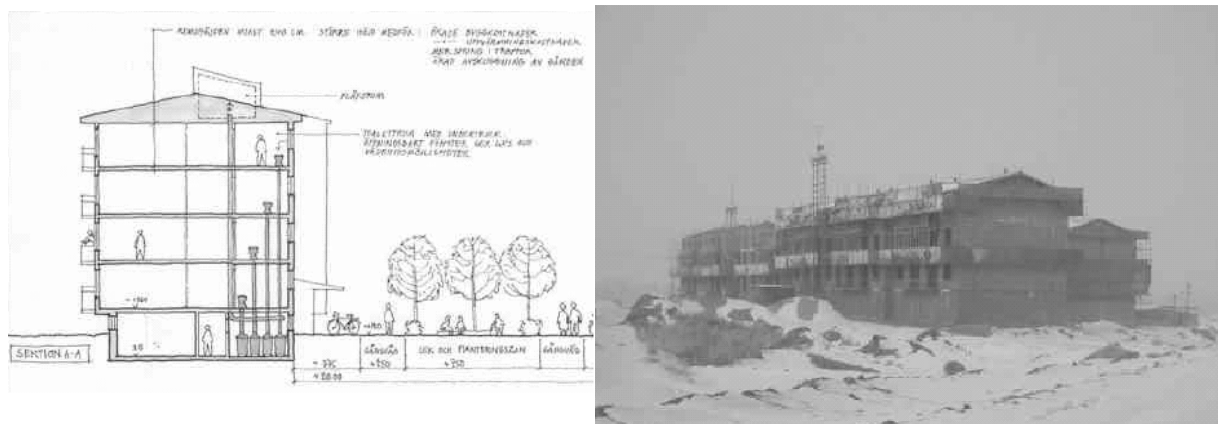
Side elevation of the sanitation system planned for 4-storey apartment buildings in Erdos (left). The apartment buildings under construction (right) (source: EcoSanRes)
